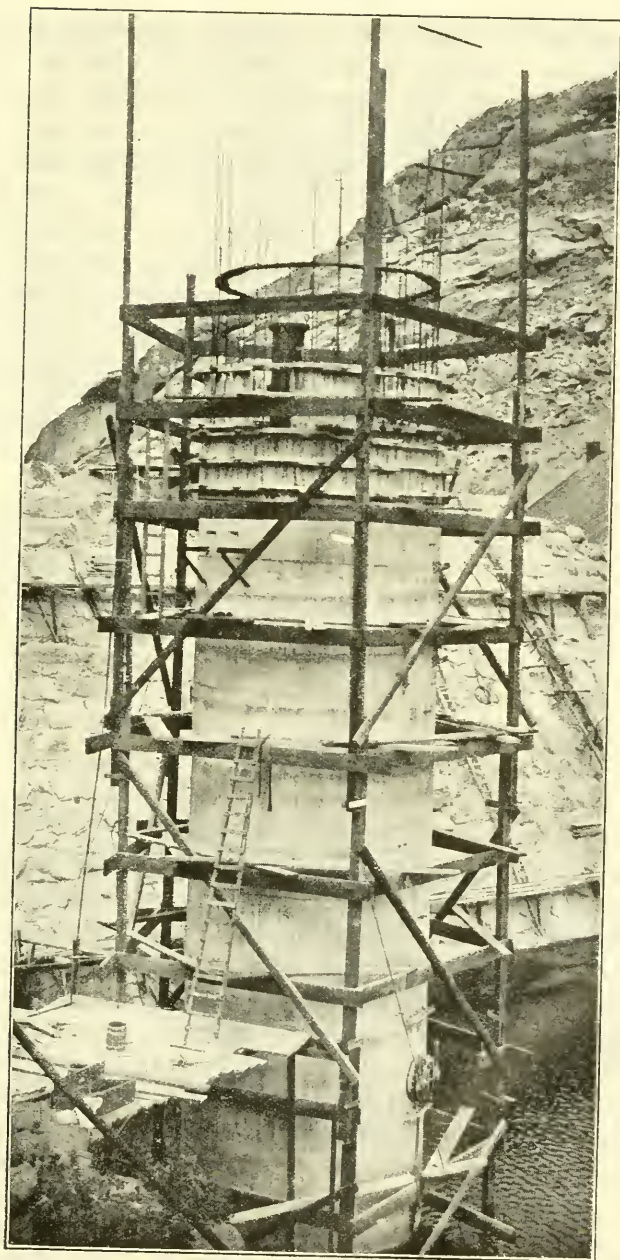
REINFORCED CONCRETE OUTLET TOWER, MORENA RESERVOIR.
